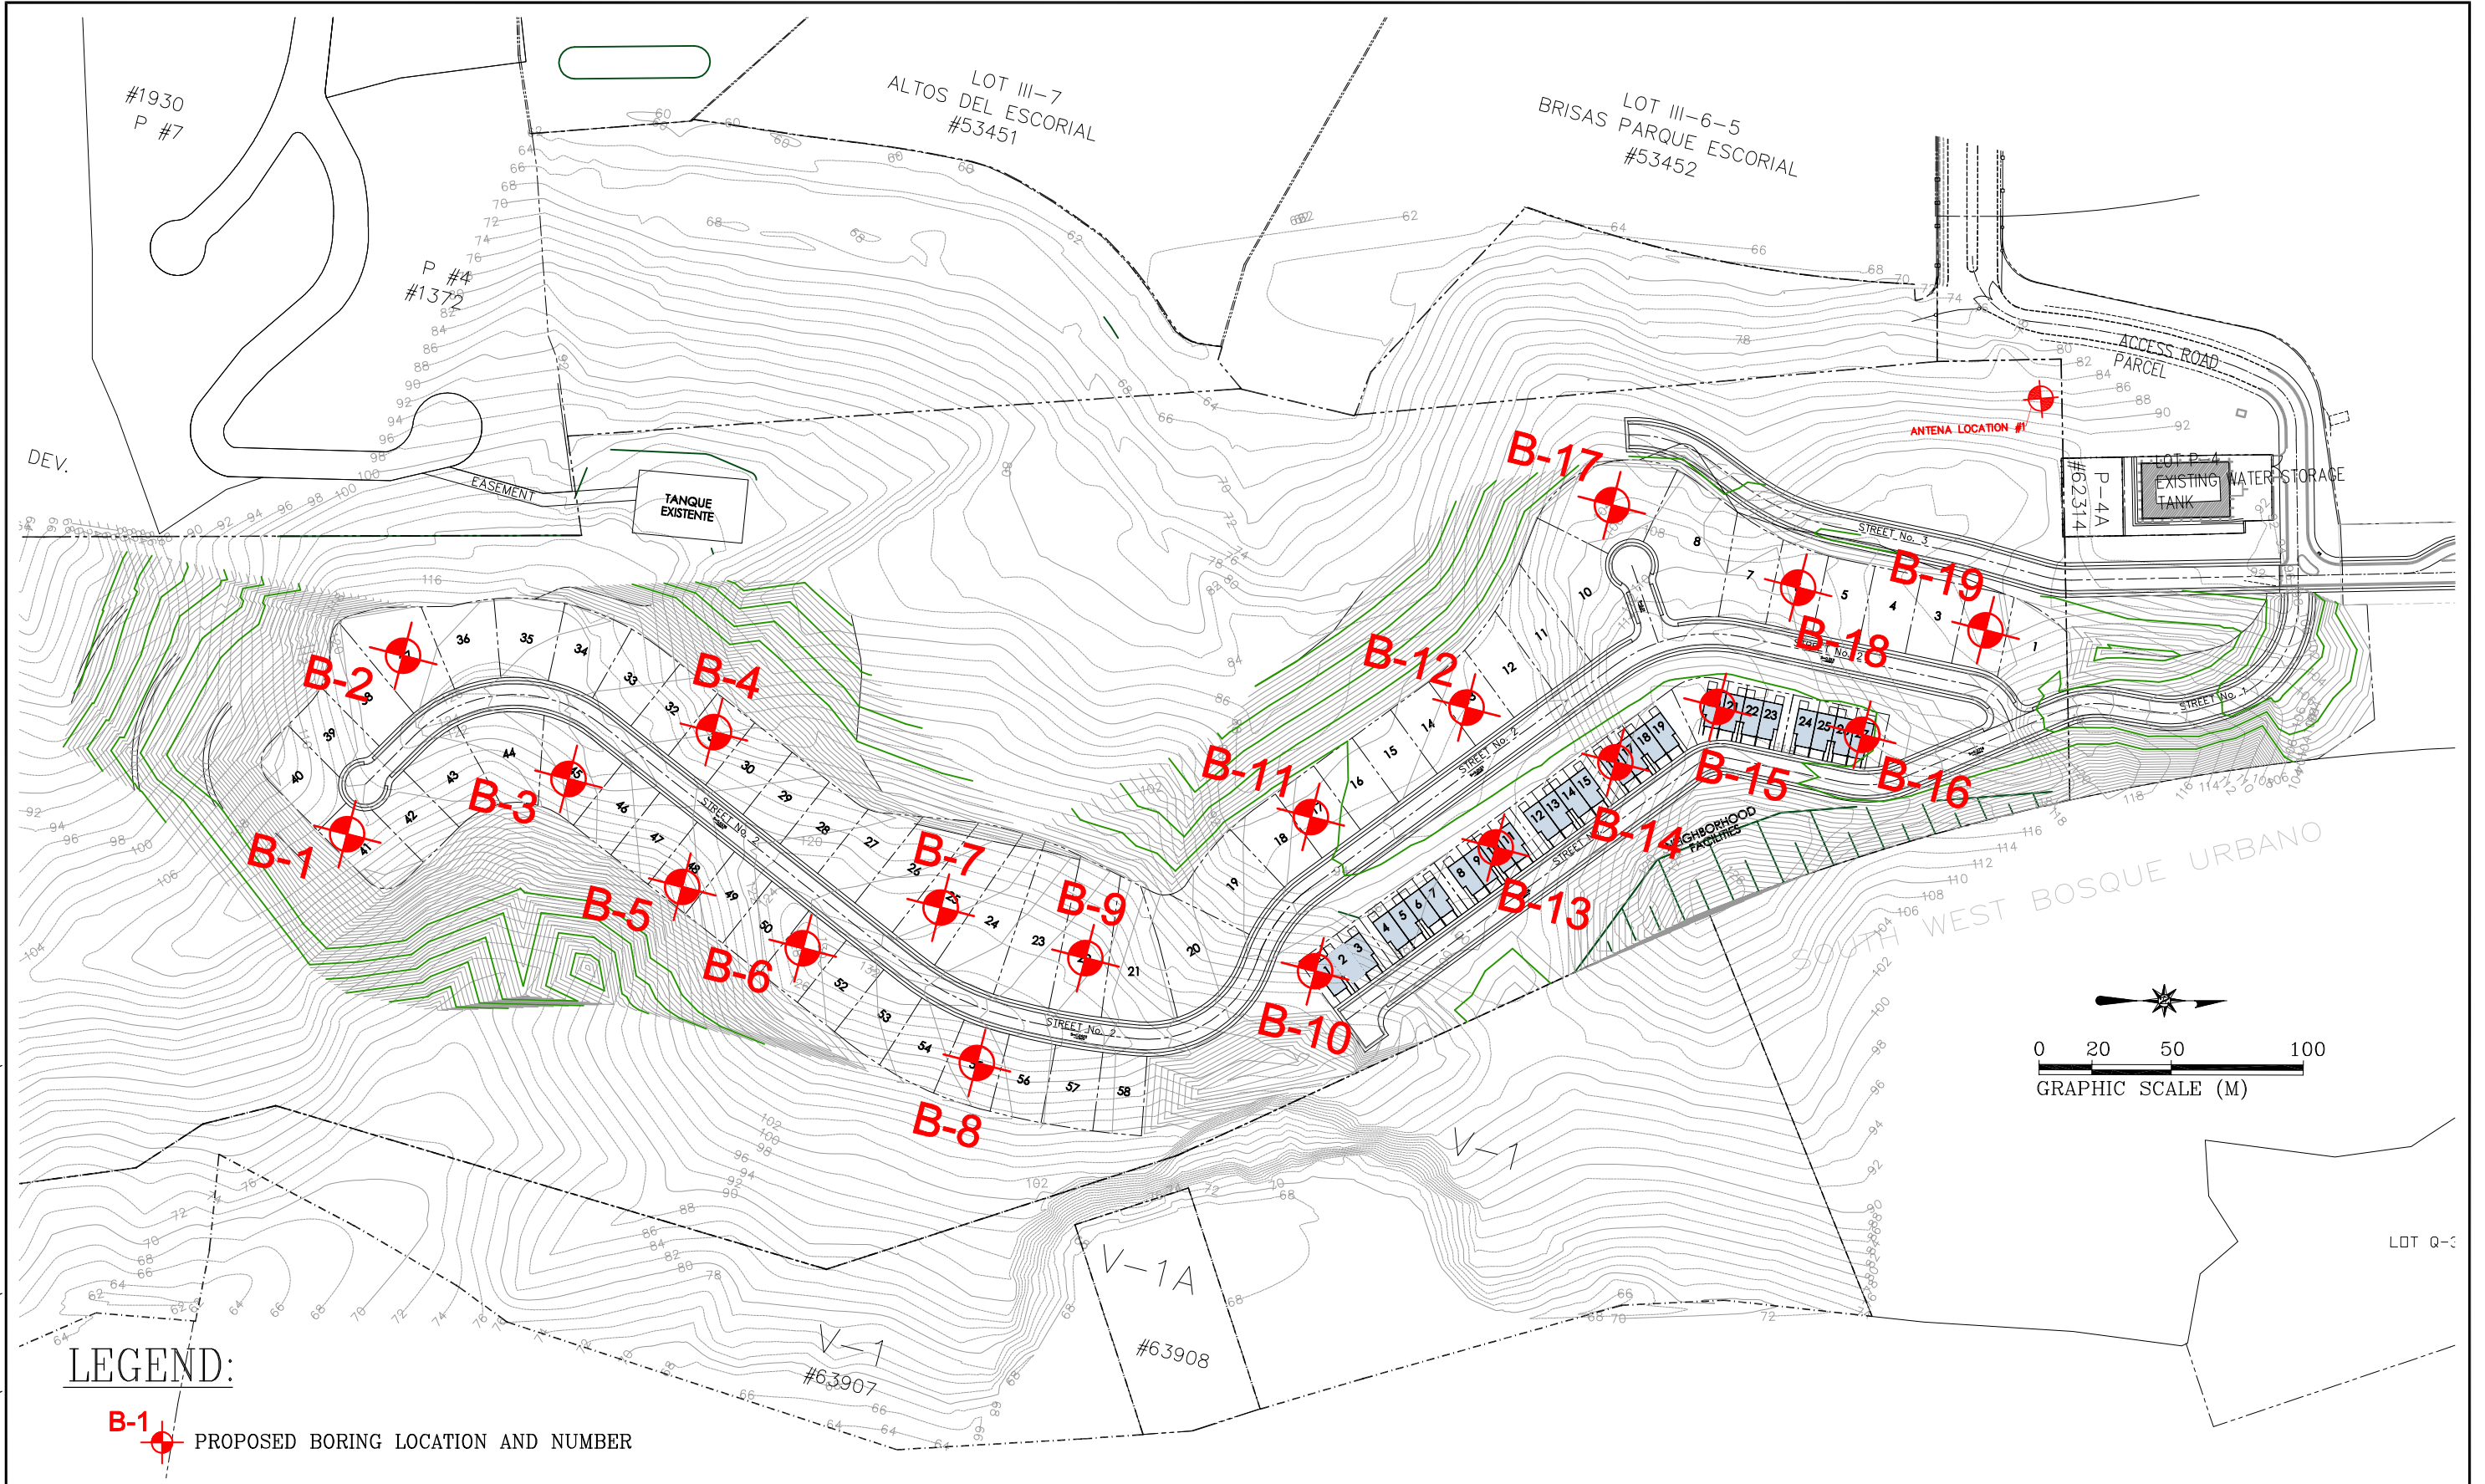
PROJECT SITE LAYOUT PLAN
